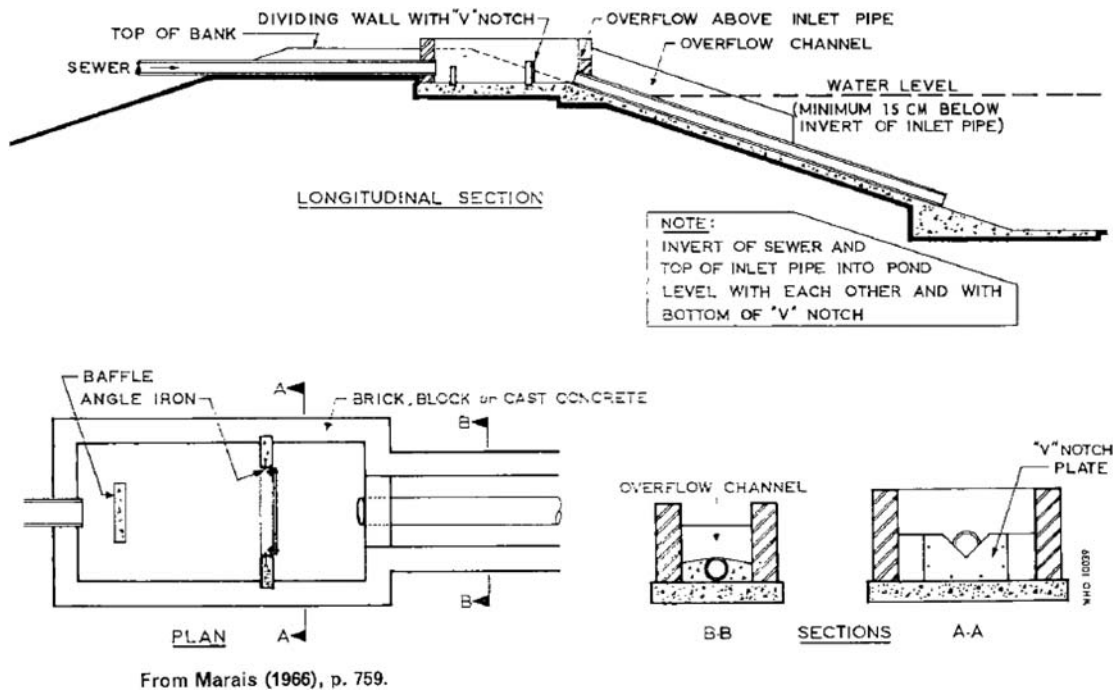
A typical inflow structure to a stabilization reservoir with an outlet measuring "V" notch plate
